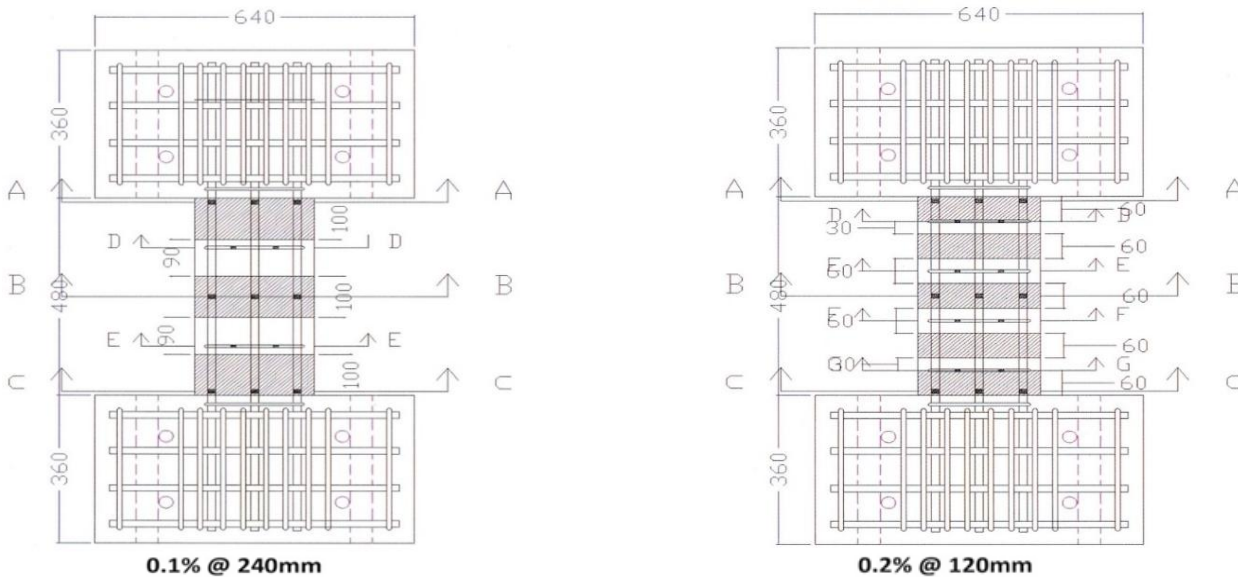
Cross-section showing reinforcement detailing of the prototype column confined with FRP wraps.
